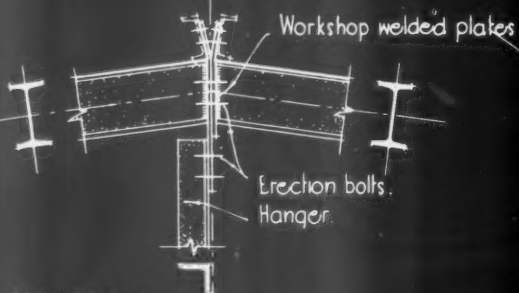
SITE COMPRESSION JOINT AT POINT C.
